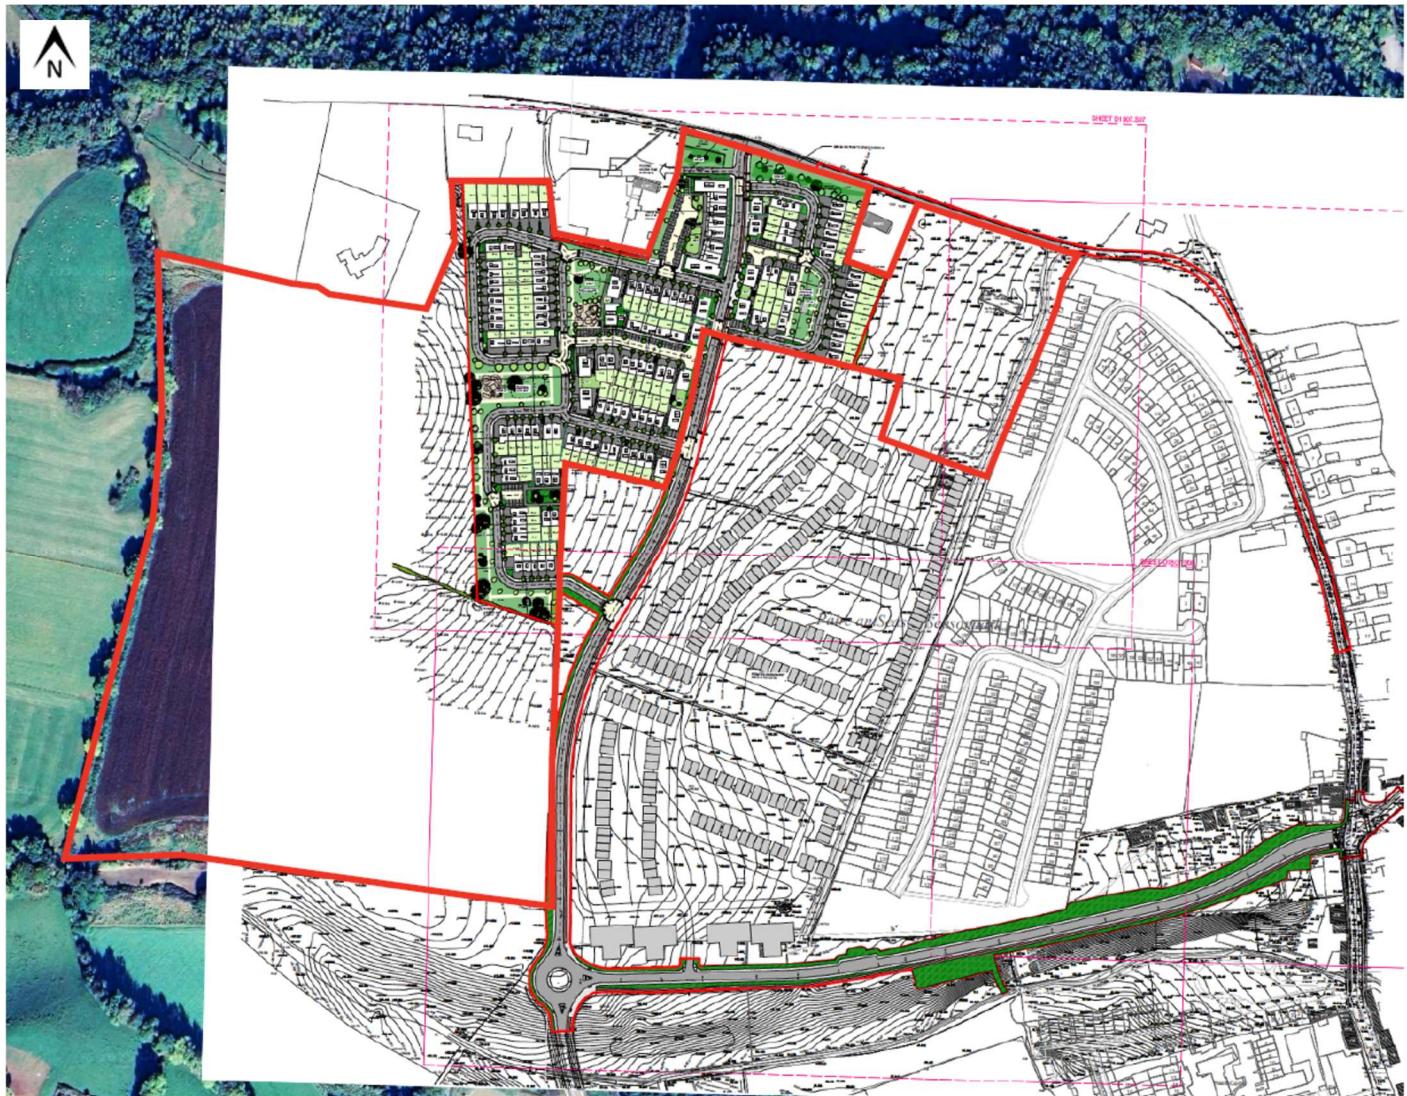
Site layout plan for 179 no. dwellings in the context of our client's overall landholding, as outlined in red.
